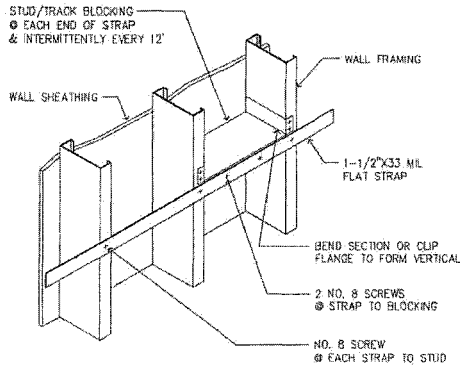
Stud Bracing with Strapping and Sheathing Material (AISI 2002d)
